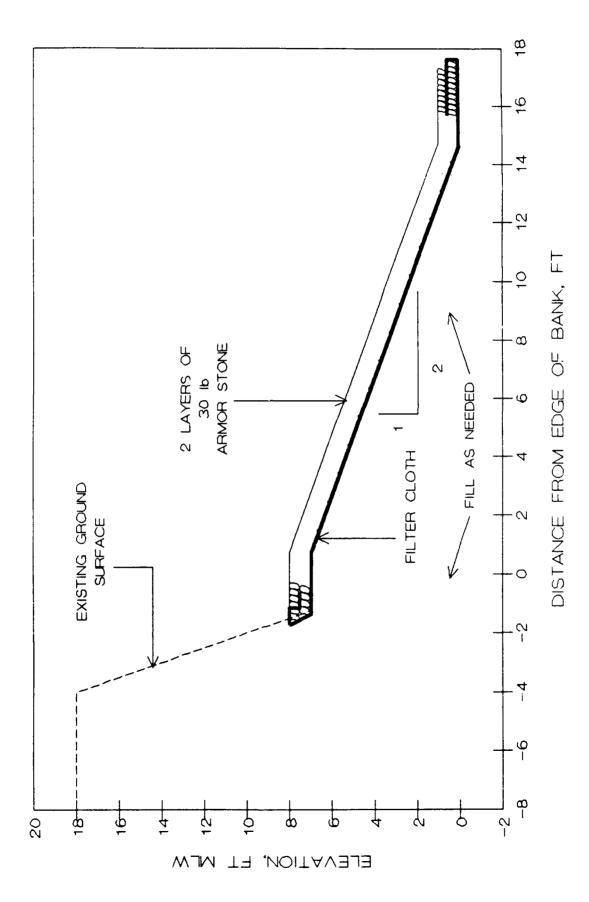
PLACED RIPRAP REVETMENT PROPOSED FOR SITE 8
